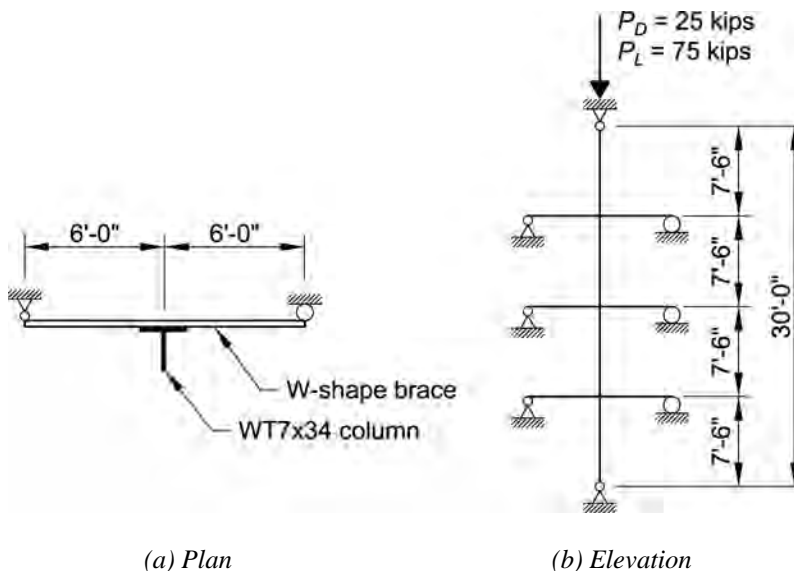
Column bracing geometry for Example A-6.2.
